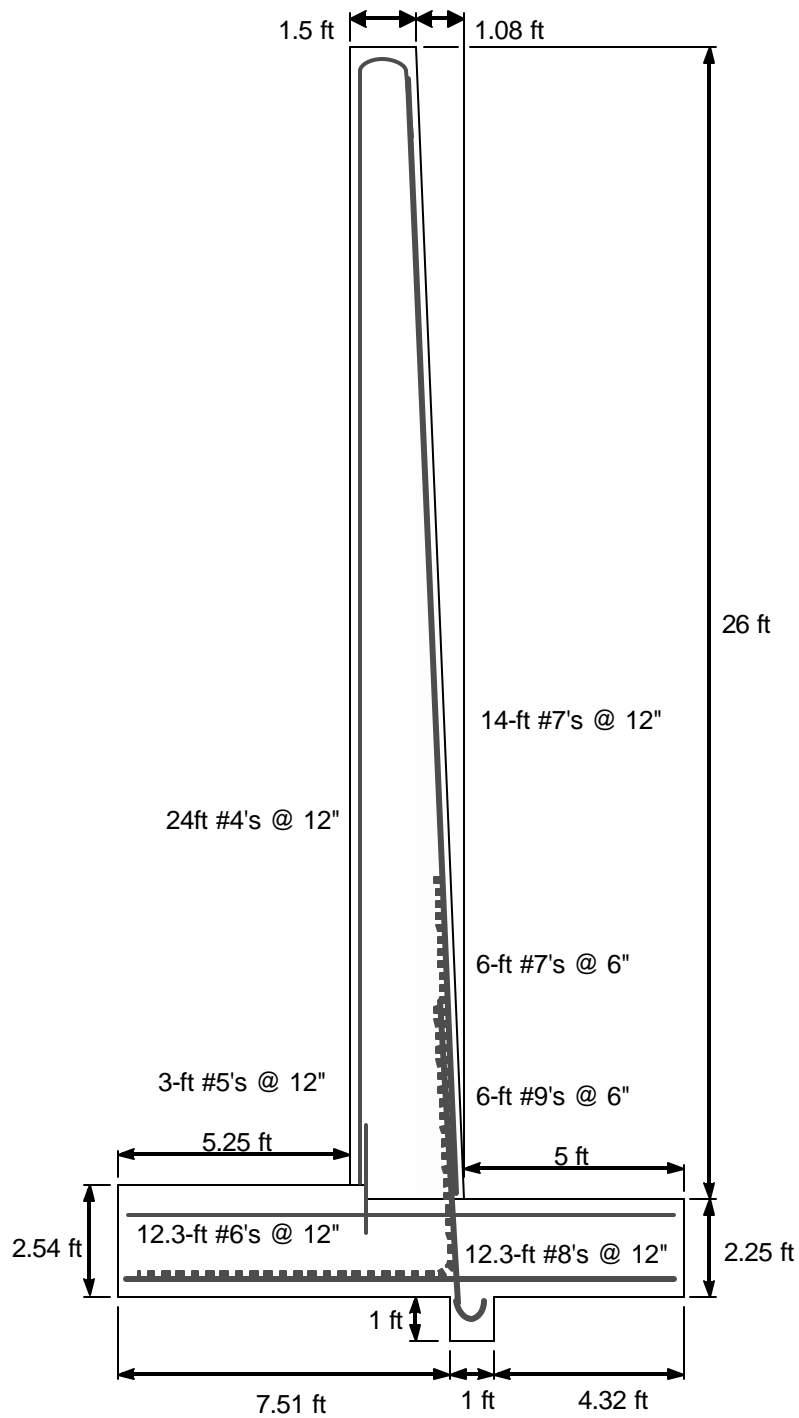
Scale drawing of retaining wall panel that was instrumented. Reinforcing bar sizes and spacings are given as total length of certain bar size spaced at X inches.
